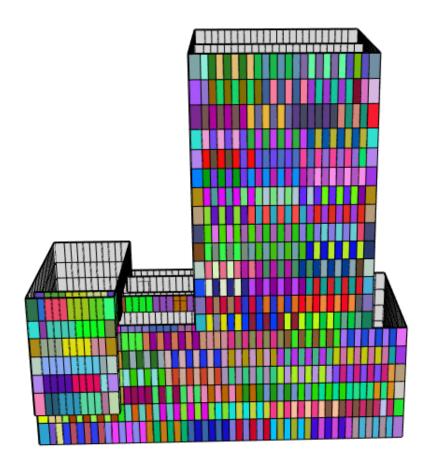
Building facade elevation divided into packs (courtesy of Permasteelisa Group).
